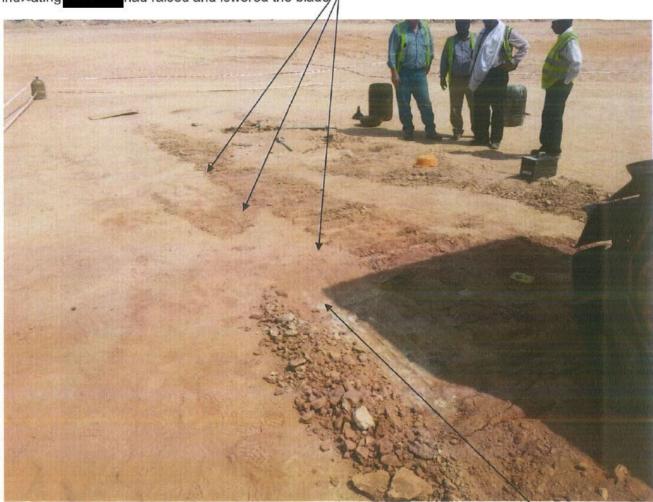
Showing blade marks on right side of machine (note blade marks were not continuous) indicating (b)(6) had raised and lowered the blade
